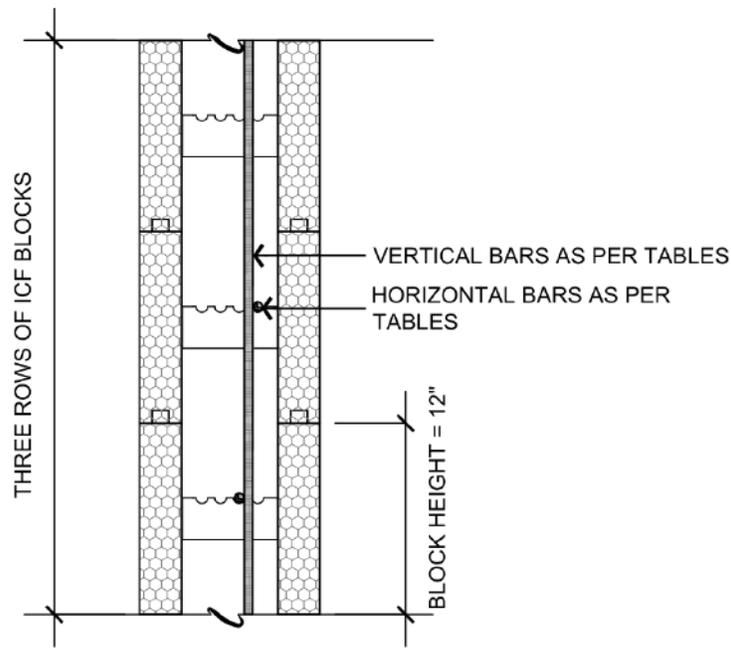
Above Grade Wall Reinforcing Placement for 6", 8" And 10" Thick Walls.
